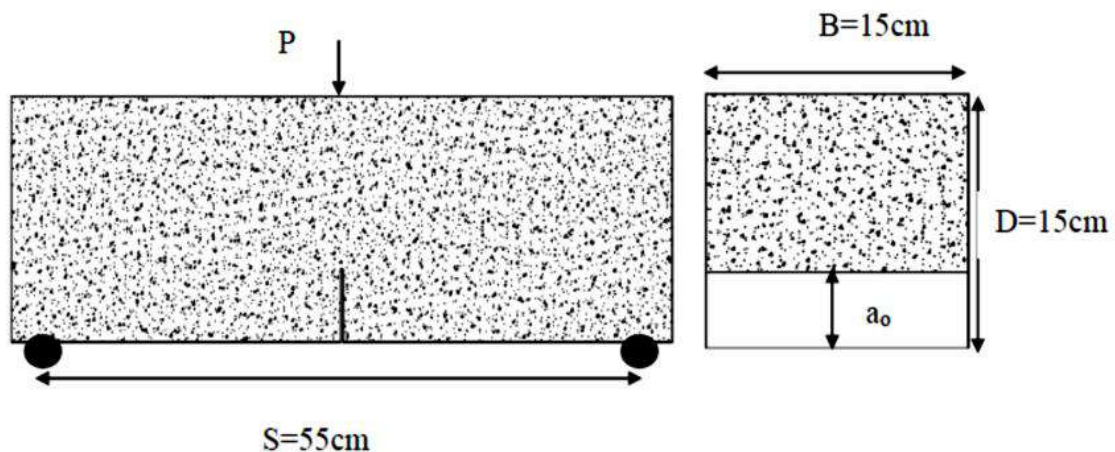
Three Point Bending Test (TPBT) Specimen Geometry.
